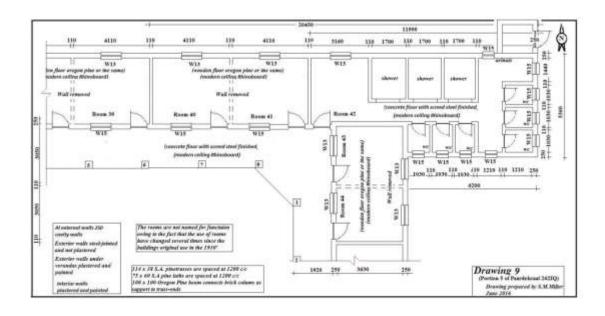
Above. Layout of rooms 39 to 44. (Drawing S.M. Miller 2016.)
